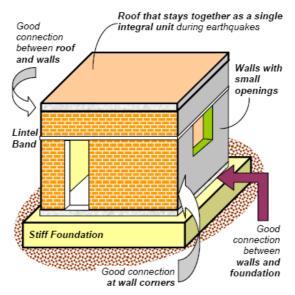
Essential Requirements To Ensure Box Action In A Masonry Building
